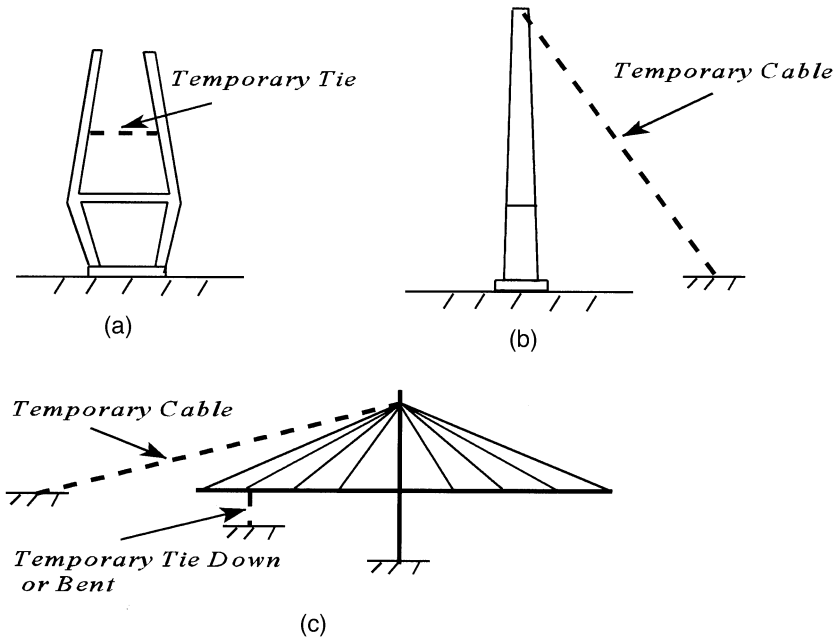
Typical construction stages. (a) Tower before completion; (b) completed tower; (c) stage with longest cantilever
